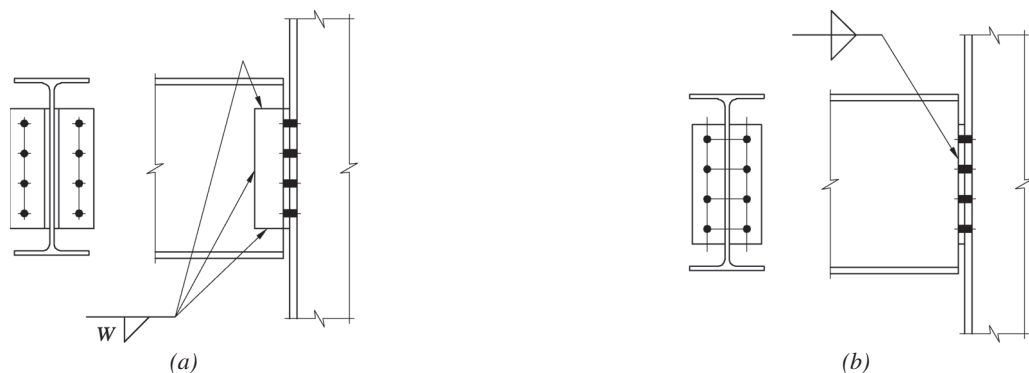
Common beam connections for axial loads. (a) Double clip angle connection. (b) Shear end plate connection.
